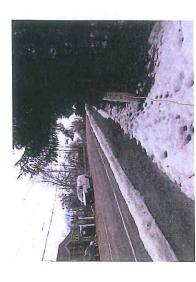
Existing High Rock Street Sidewalk at Town Forest Driveway
